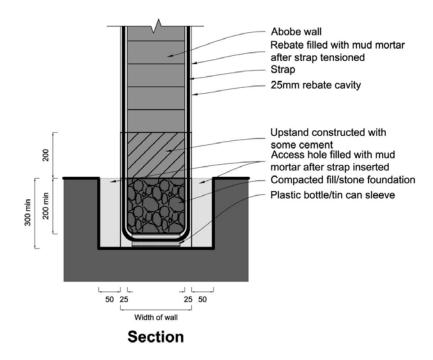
A section through the base of a wall showing a strap threaded through an empty tube. For existing walls a hole is formed by digging from both sides of the wall to pass the strap under.
